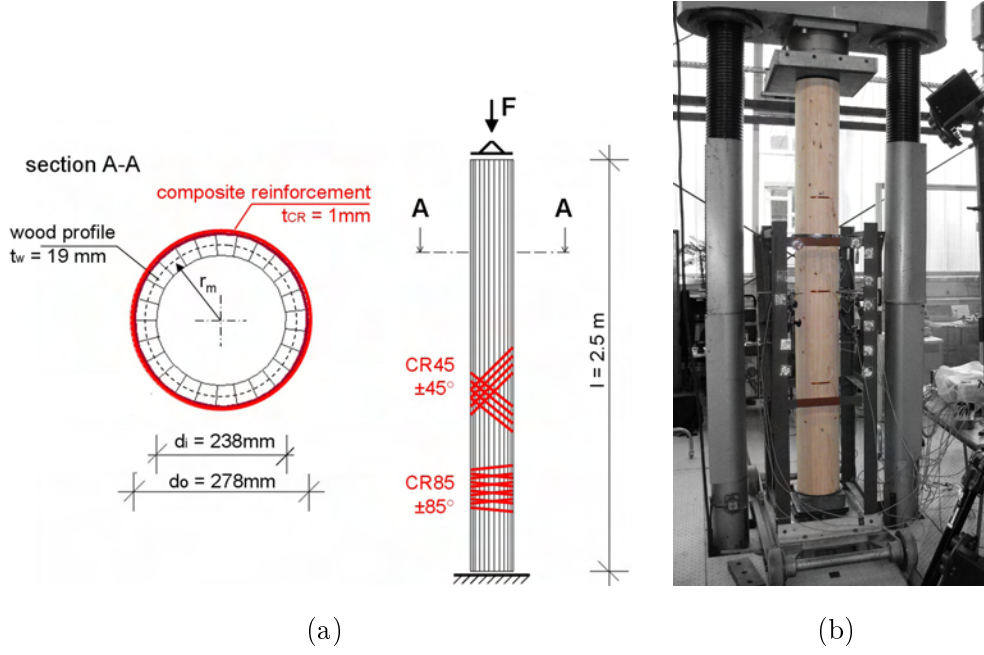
Dimensions of the tube (a) , and test set-up (b).
